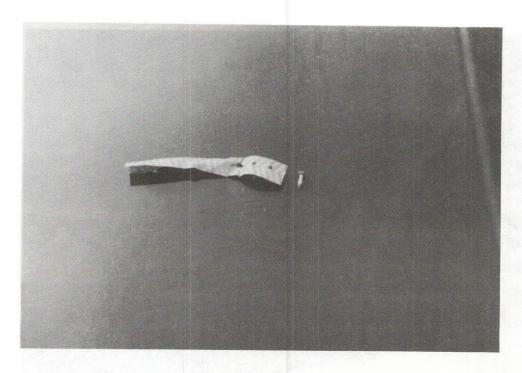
Tie and fastener used to connect intercepting concrete masonry wall.
